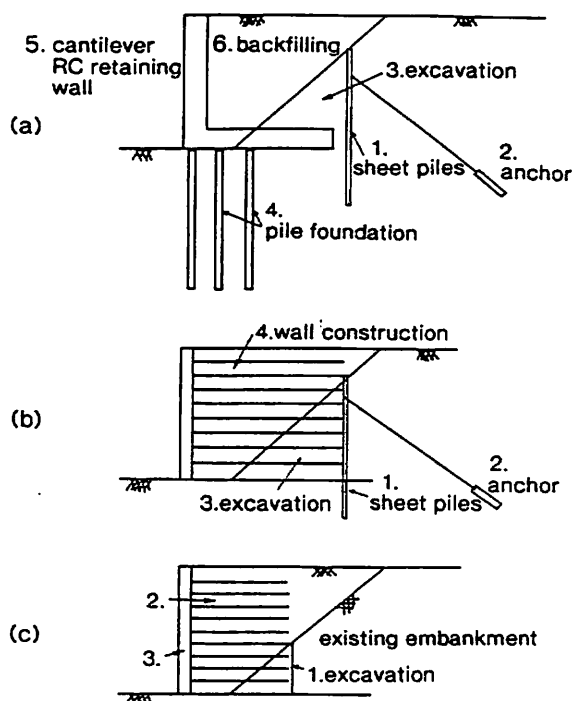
Reconstruction of existing slope by three methods: (a) a conventional RC cantilever retaining wall, (b) a reinforced soil retaining wall having a relatively long reinforcement, and (c) a GRS-RW having a continuous rigid facing and a short geotextile (the numbers indicate the construction sequences).
